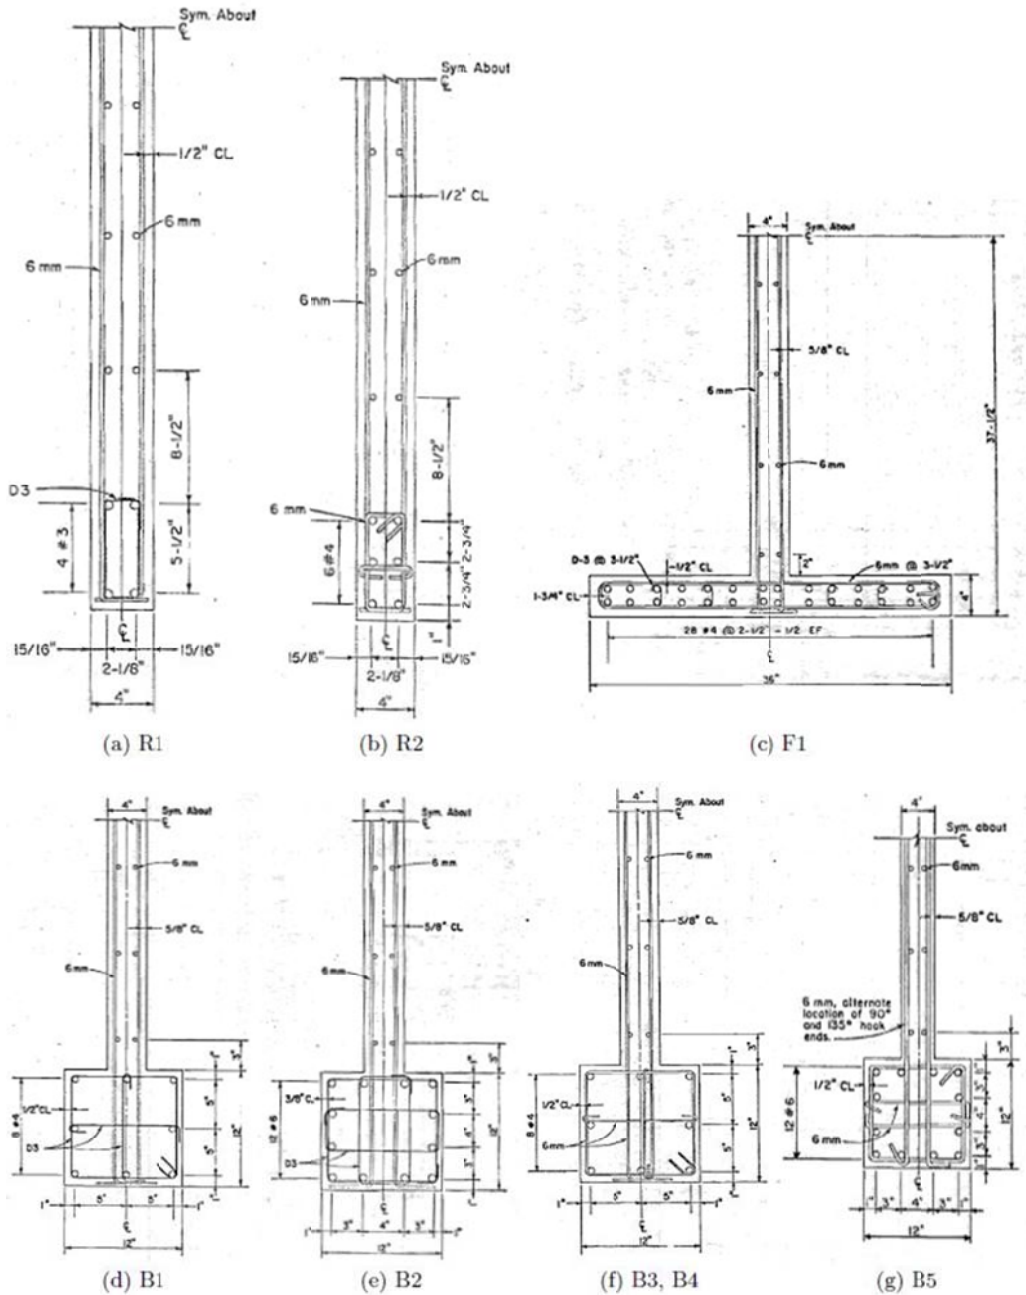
Wall specimen cross-sections of Oesterle et al. (1976 and 1979)
